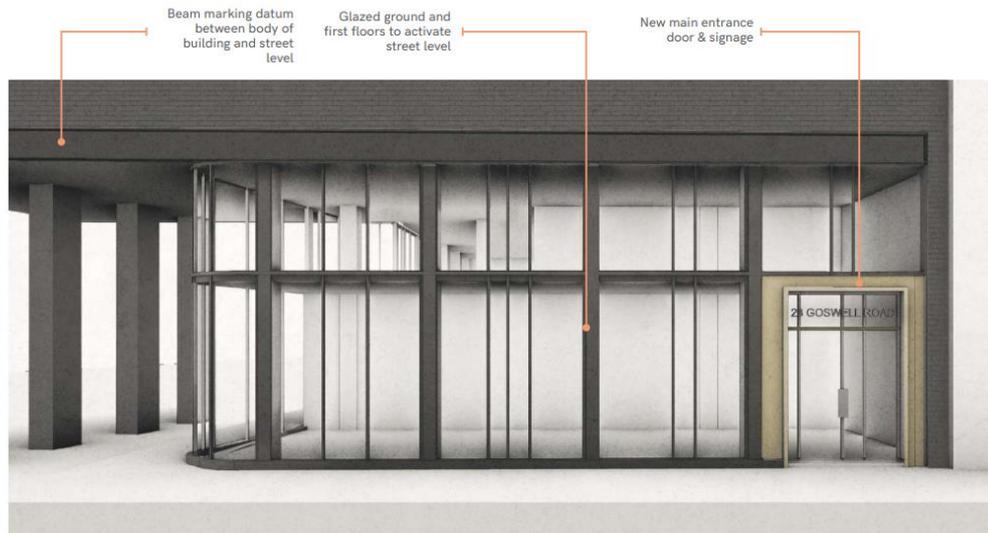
Proposed fenestration arrangement to the ground floor front façade
